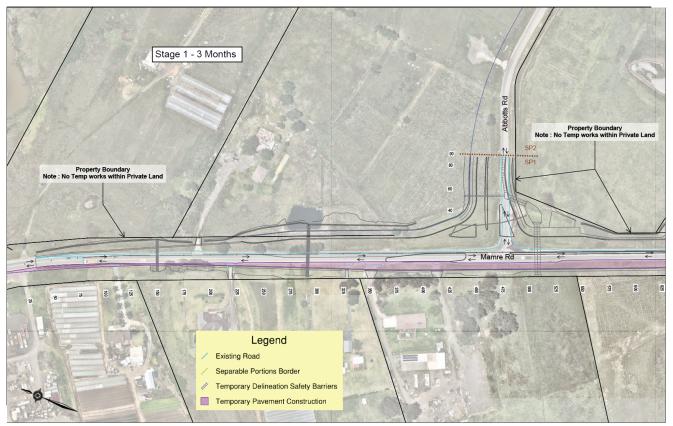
Mamre Road / Abbotts Road Upgrade - Construction Stage 1 - Refer to Robson Staging Plan
